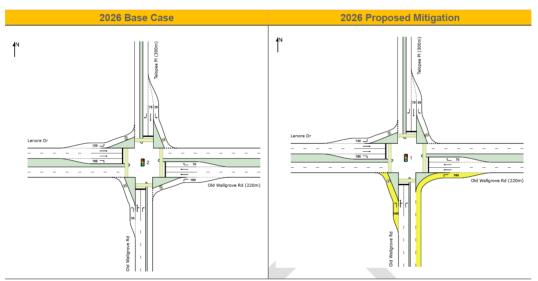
Proposed upgrades at Old Wallgrove Road/Lenore Drive intersection (Source: Ason Group)
